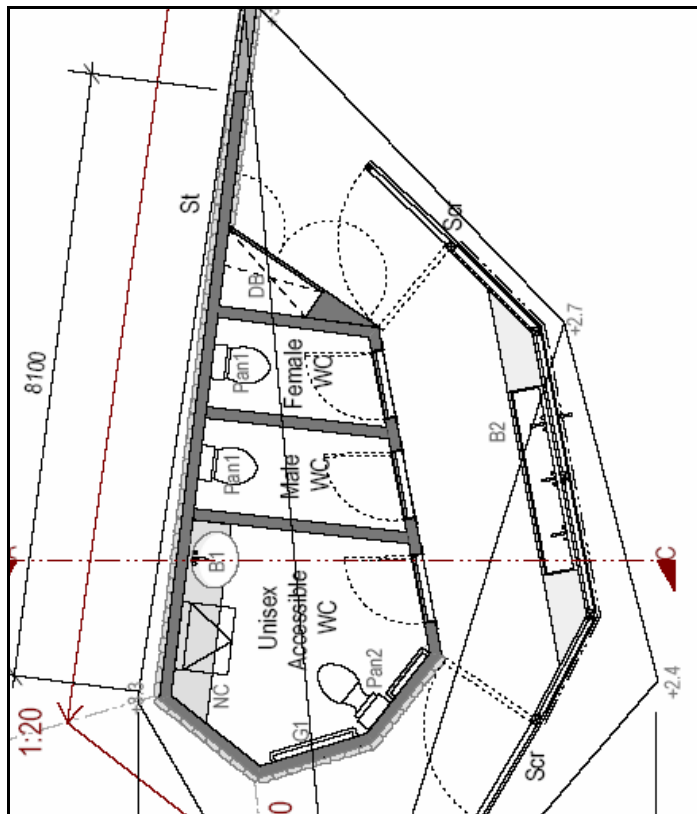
Design of proposed new toilet block. The hand washing area is located behind a semi-transparent wall which will discourage loitering and reduce opportunities for anti-social behaviour
